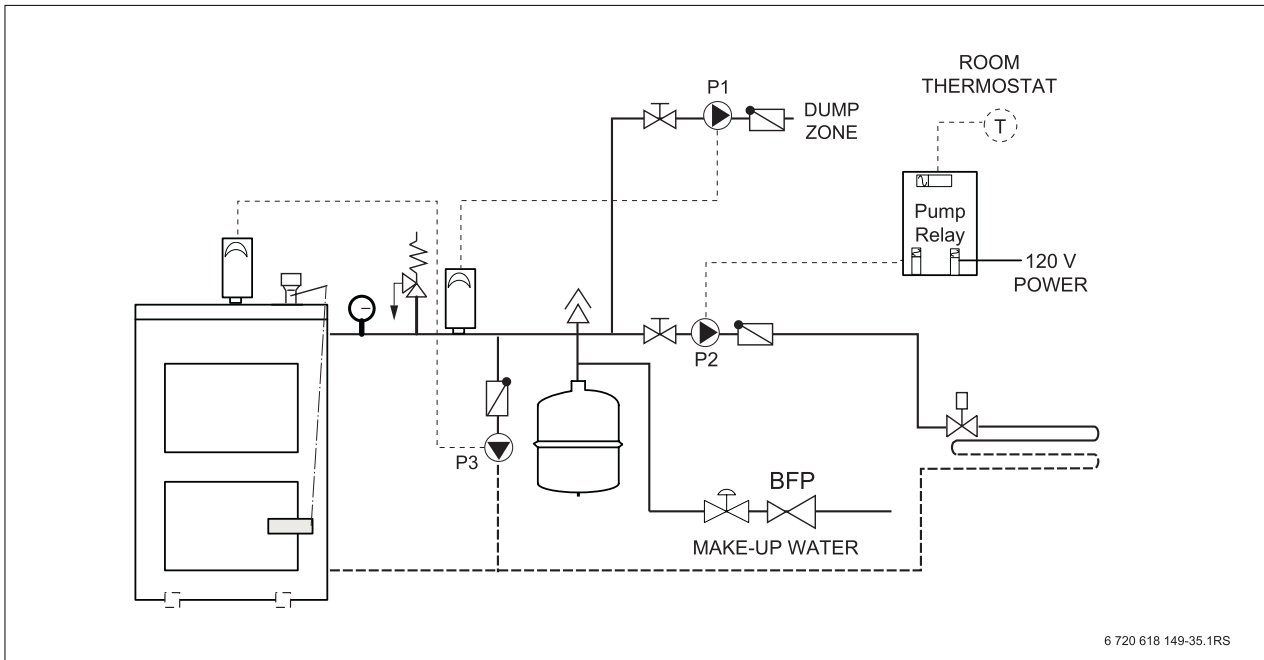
Wood coal boiler with optional dump zone (installation example)
